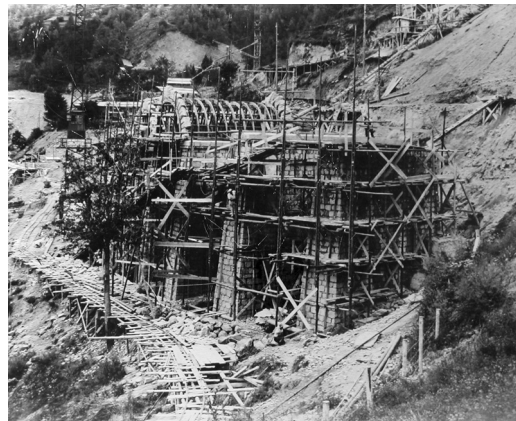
Construction site of a group of masonry arches supporting the internal street, approx. 1935 (Archivio Storico Ospedale Morelli).
